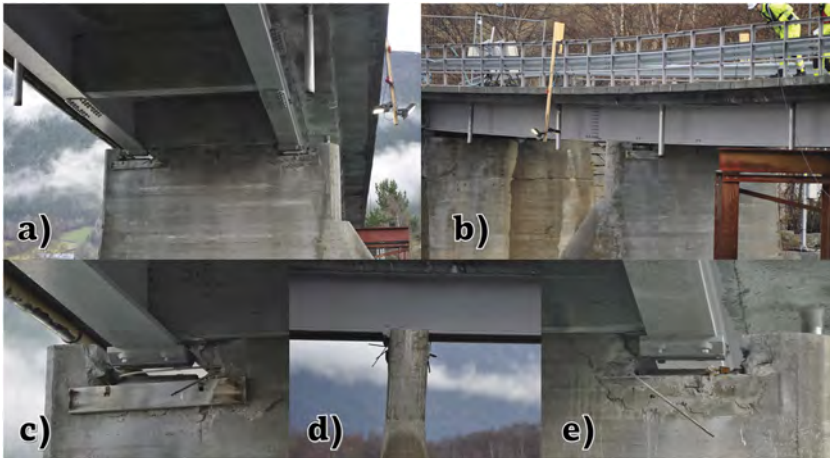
Overview of damage on Marlo Bridge – pictures taken in November 2021. Figures a), c) and e) show bursts in concrete at the support, d) – tilt of the damaged pilar, b) – forced deflection.
